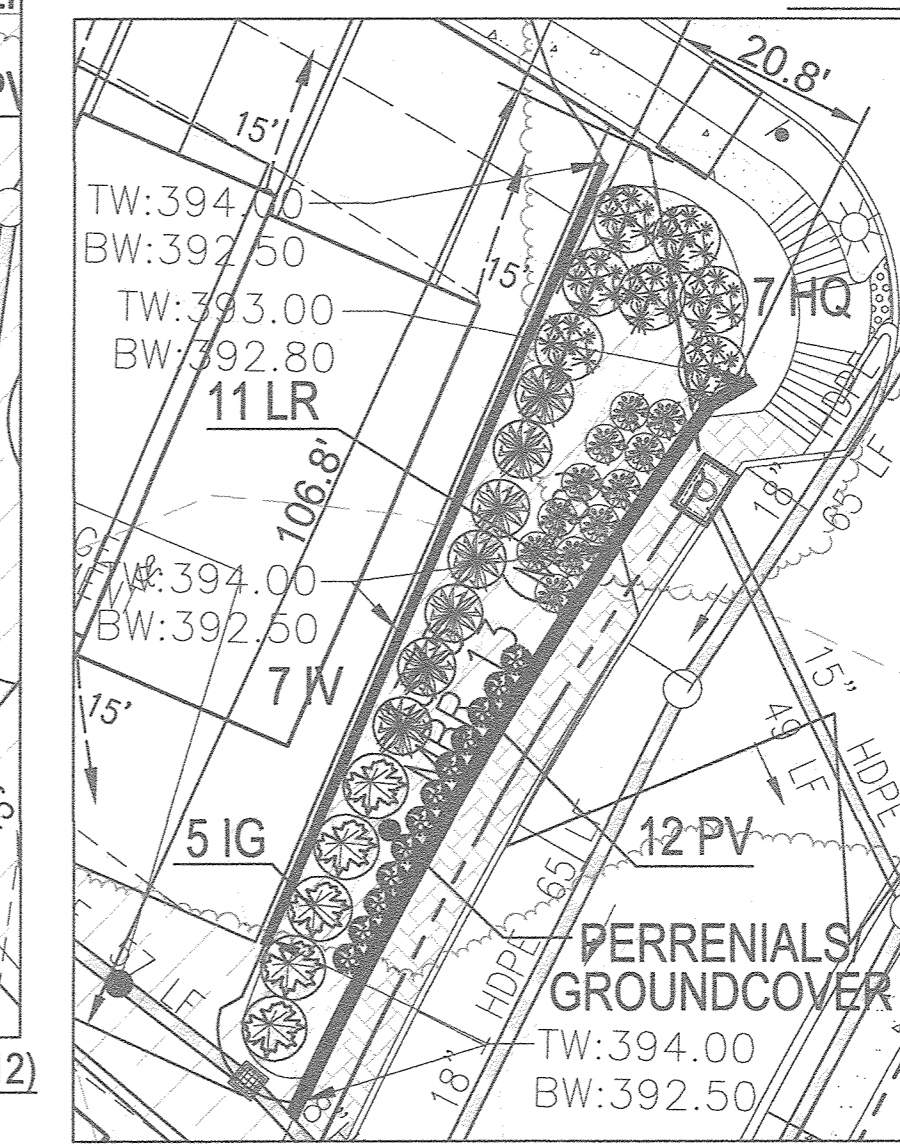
DETAILED BIO AND PLANTING PLAN (SWM #10)
